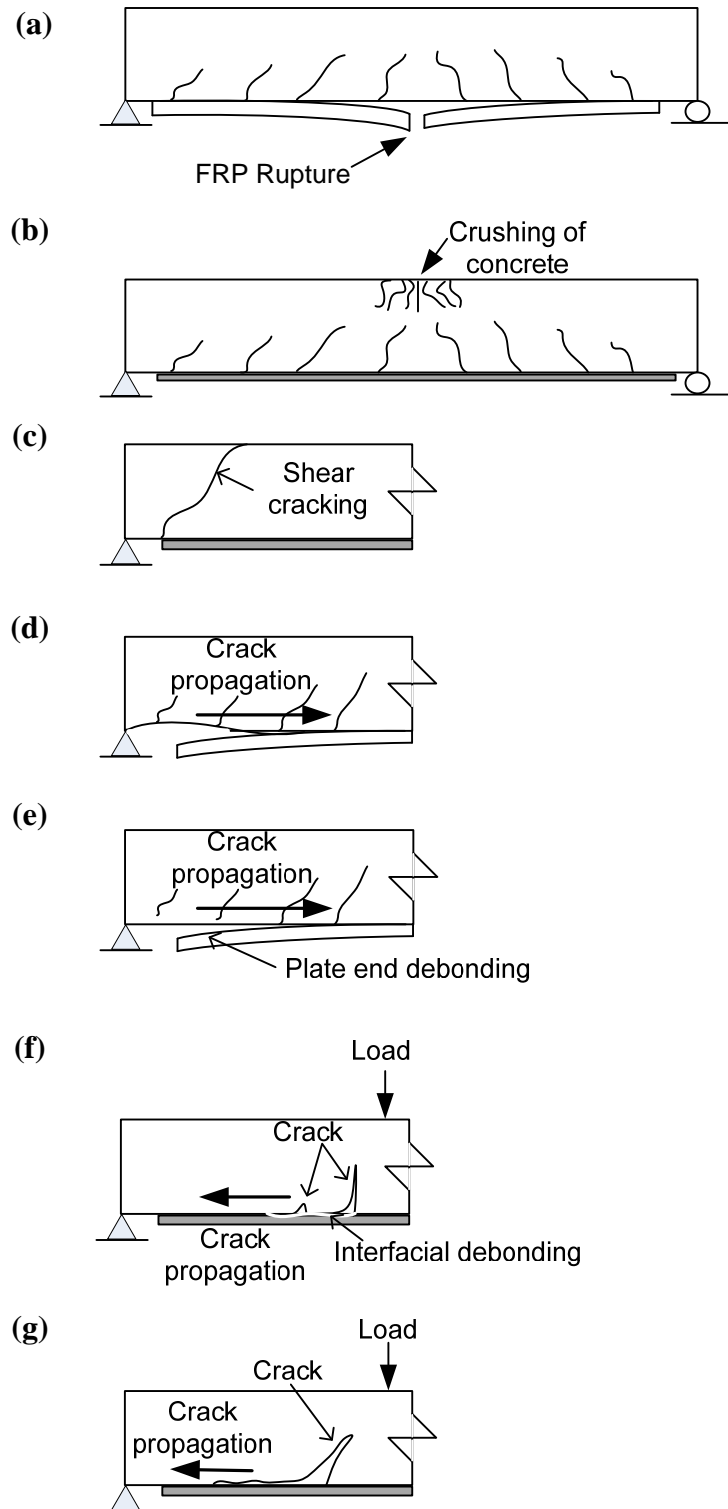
Failure modes of FRP-strengthened RC beams (a) FRP rupture (b) crushing of compressive concrete (c) shear failure (d) concrete cover separation (e) plate-end interfacial debonding (f) intermediate flexural crack-induced interfacial debonding (g) intermediate flexural shear crack-induced interfacial debonding
